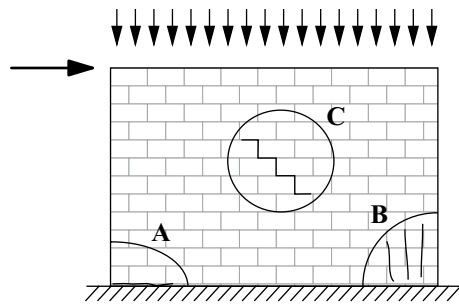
Different types of failure that can occur in masonry walls
